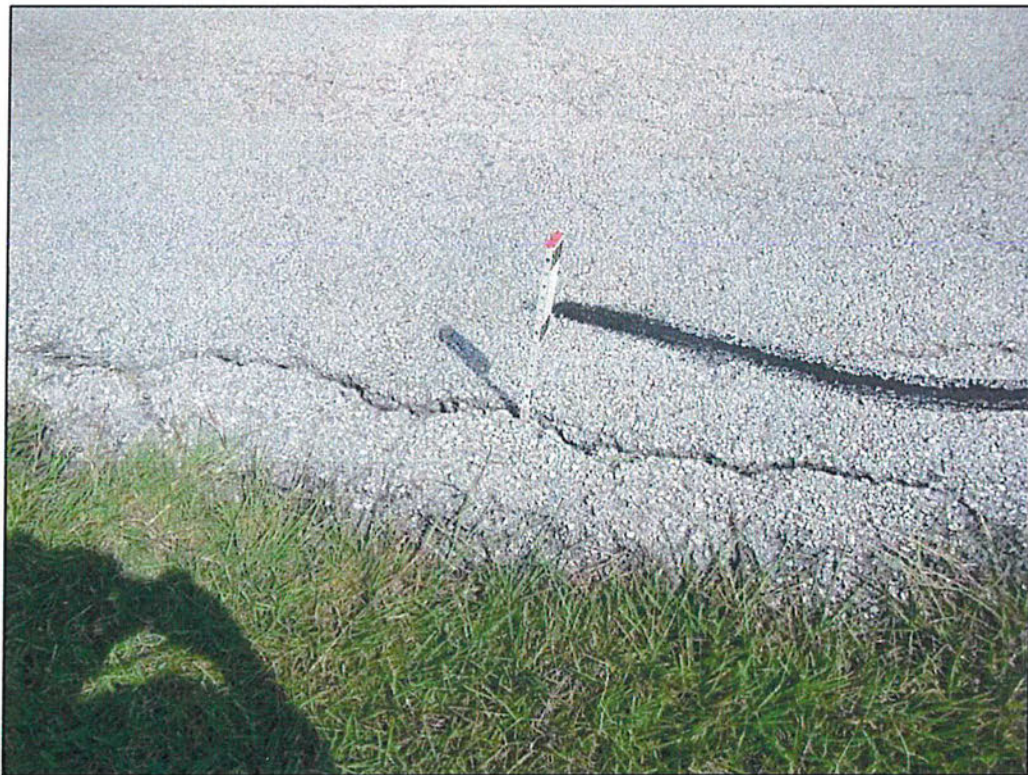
Crest. Typical cracking. Probed to 4 inches.
